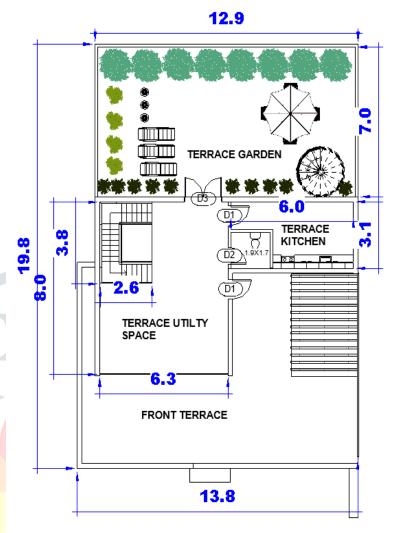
Second Floor Plan Layout (Level 3) units are in m.
